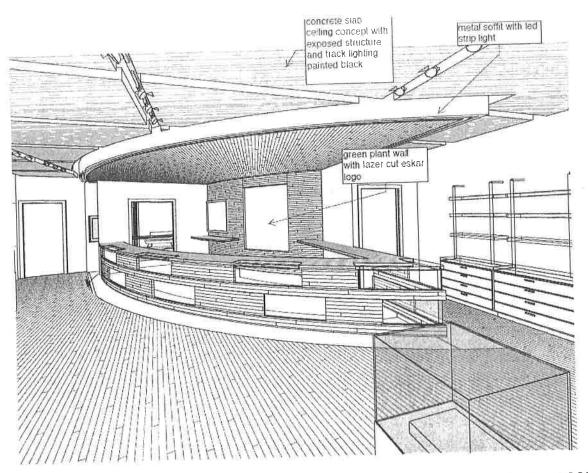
EXAMPLE OF STORE DESIGN. WOOD PANELING WILL COVER THE WALLS AND FLOOR GIVING THE STORE A MORE ORGANIC FEEL. THE CEILING WILL BE A CONCRETE SLAB DESIGN WHICH COMPLIMENTS THE WOOD PANELING.
